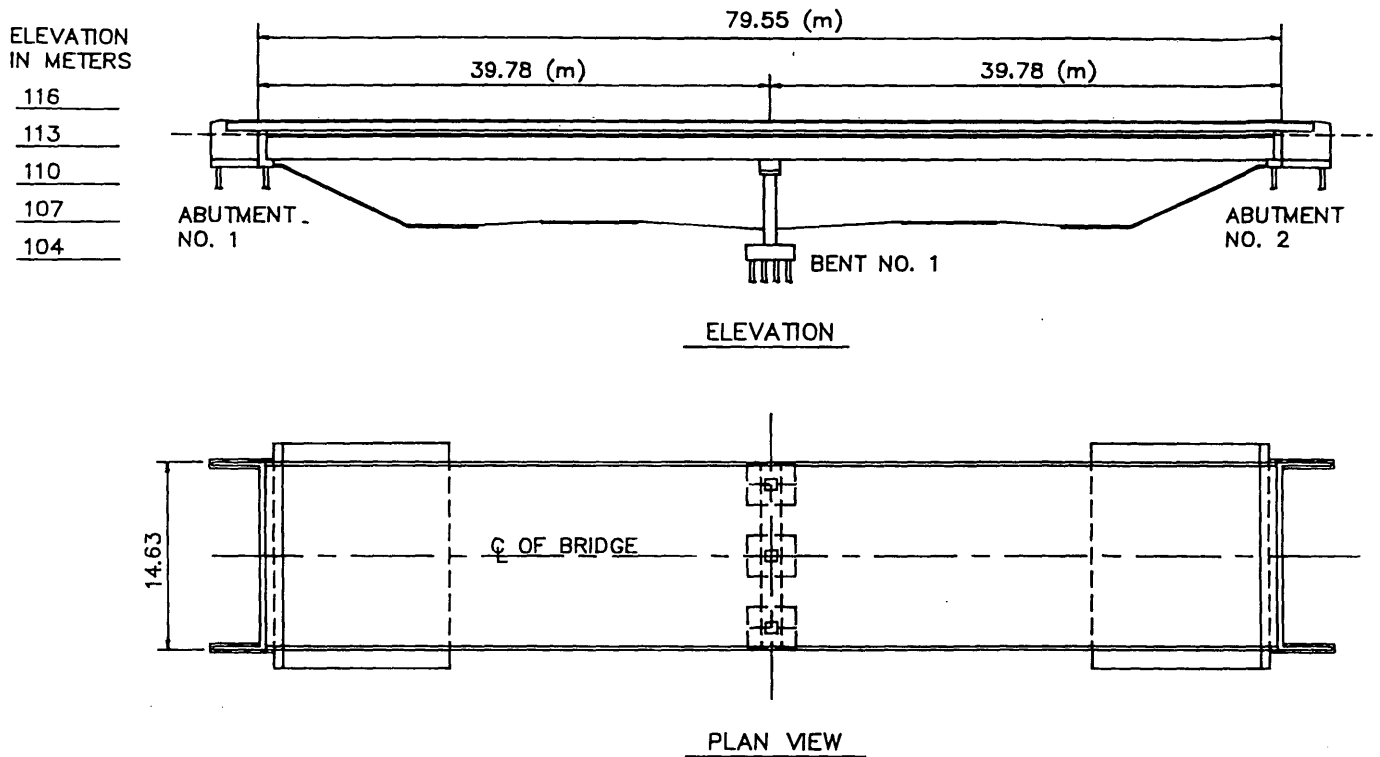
Plan and elevation of Madison County bridge (SR-233 over I-40) constructed by TnDOT in 1992 (1 m = 3.281 ft).
